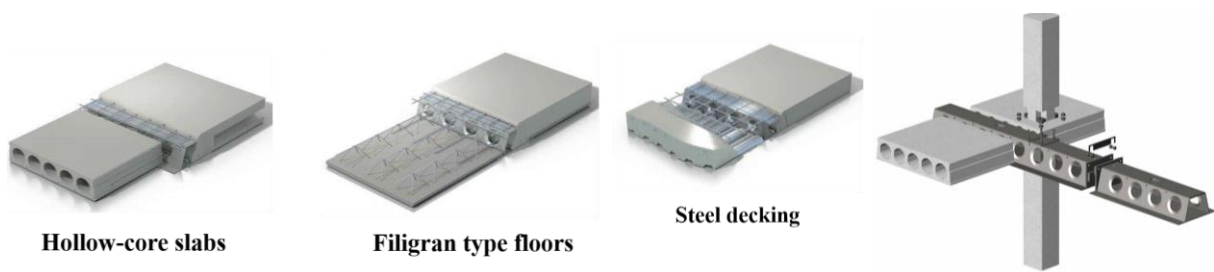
The shallow flat soffit precast concrete floor systems
